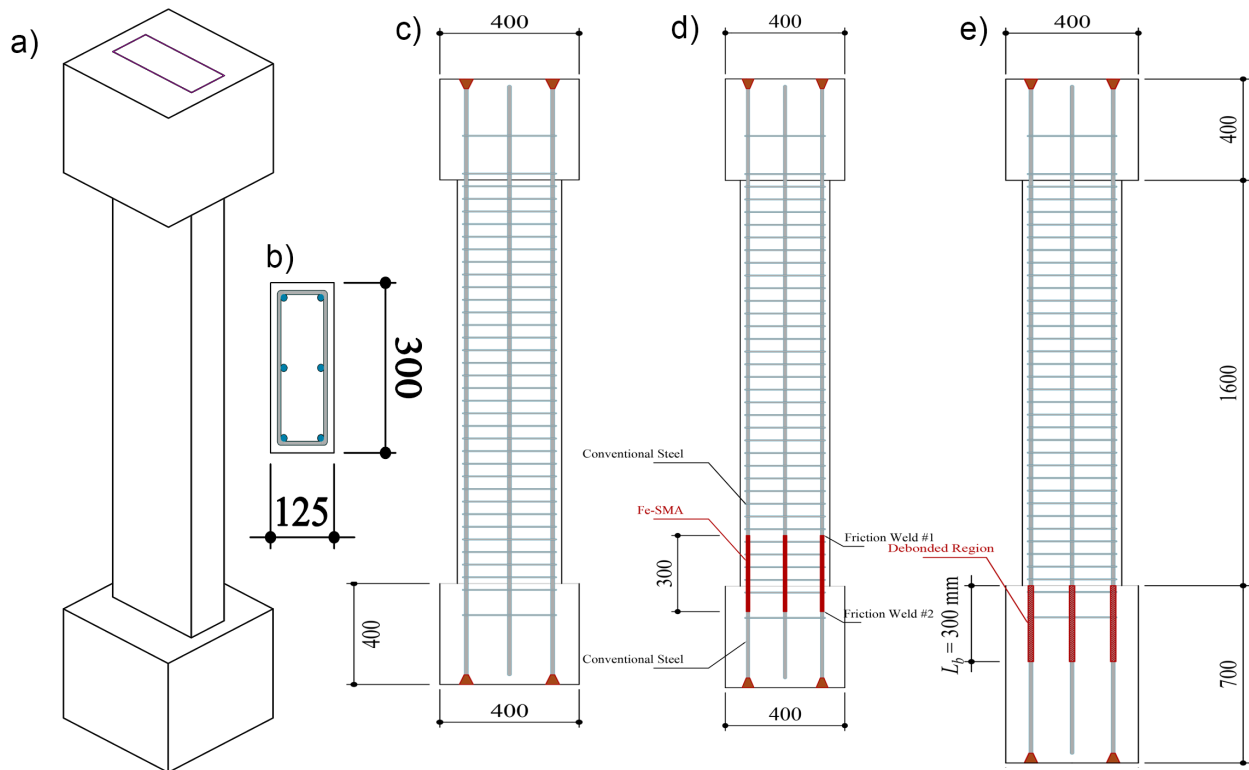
Long Boundary Elements (LBEs) (a) isometric 3-dimensional elevation view (b) cross-section with reinforcement detailing (c) typical unit with reinforcing material used over the entire length (d) F_e -SMA material used over small length at base (e) F_e -SMAs debonded from concrete over specified height (not to scale) (dimensions in mm)
